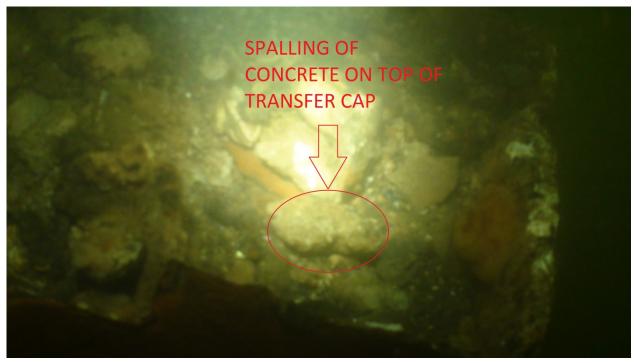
Spalling of concrete on the top of transfer cap.
